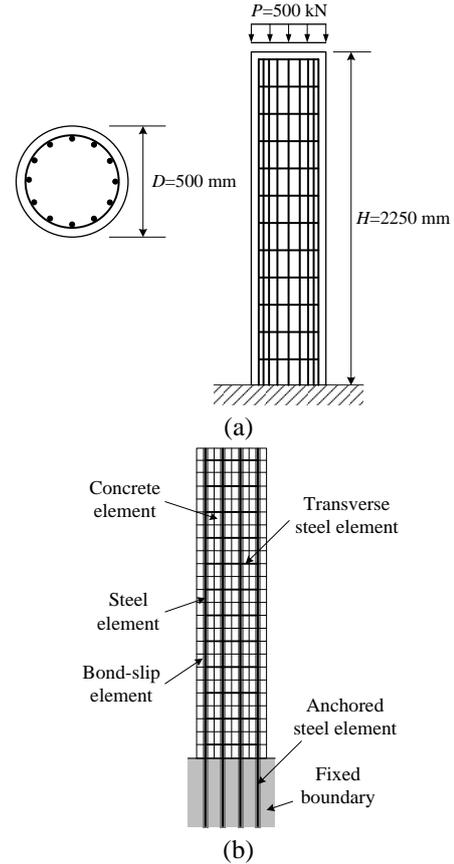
Finite element modeling of the reinforced concrete column; (a) column configuration; (b) composition of reinforced concrete structural elements
